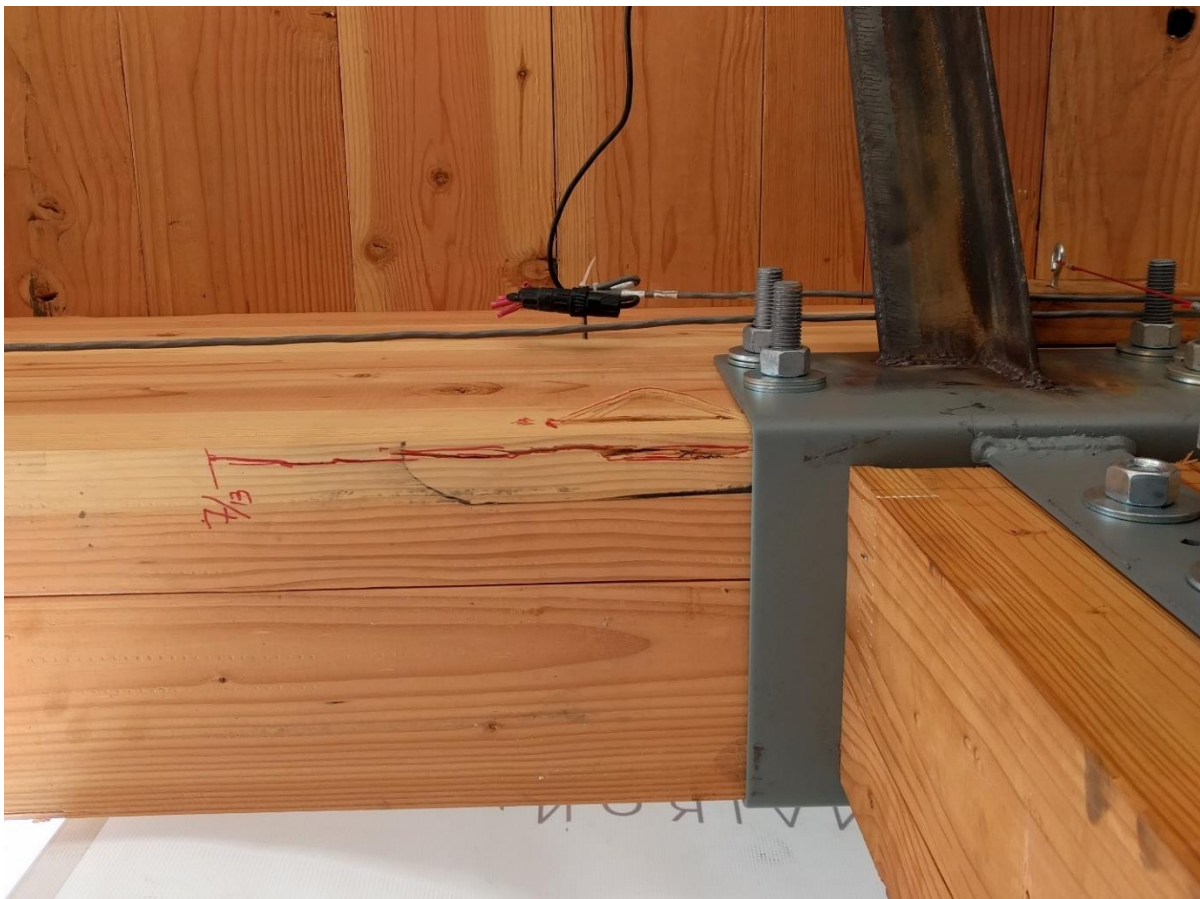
Crack and small splitting at a beam located on the NE section of the second floor
